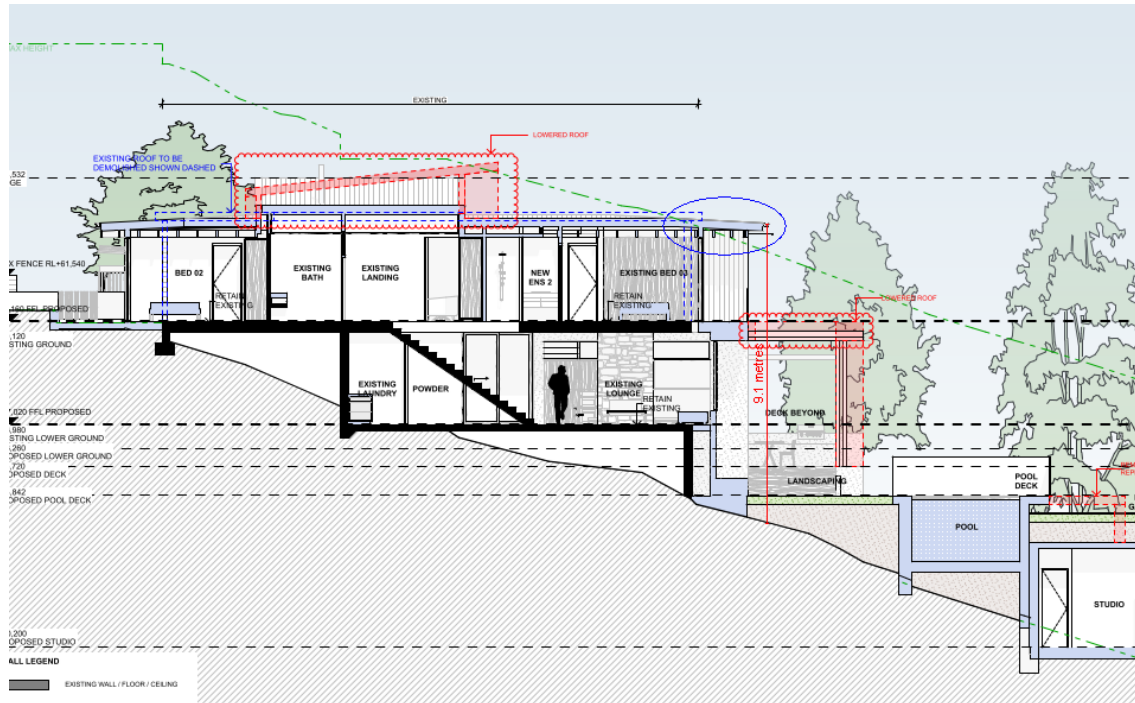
Extract of long section showing of building. Blue circle showing the area encroaching the 8.5m height plane.
